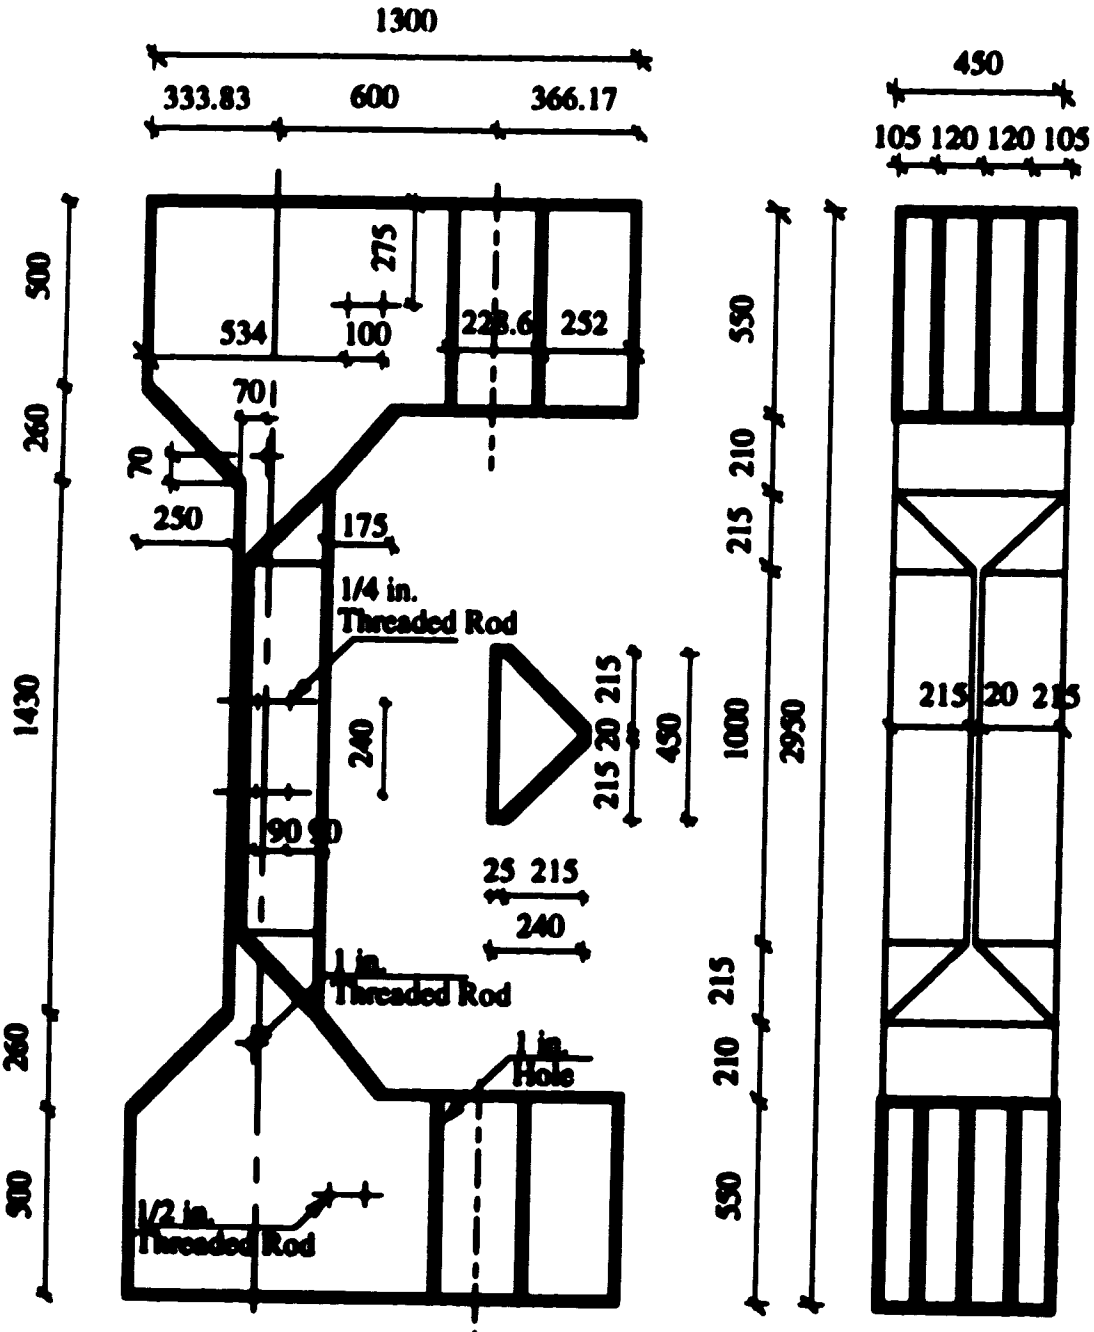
Concrete Dimensions for The Triangular Specimens
